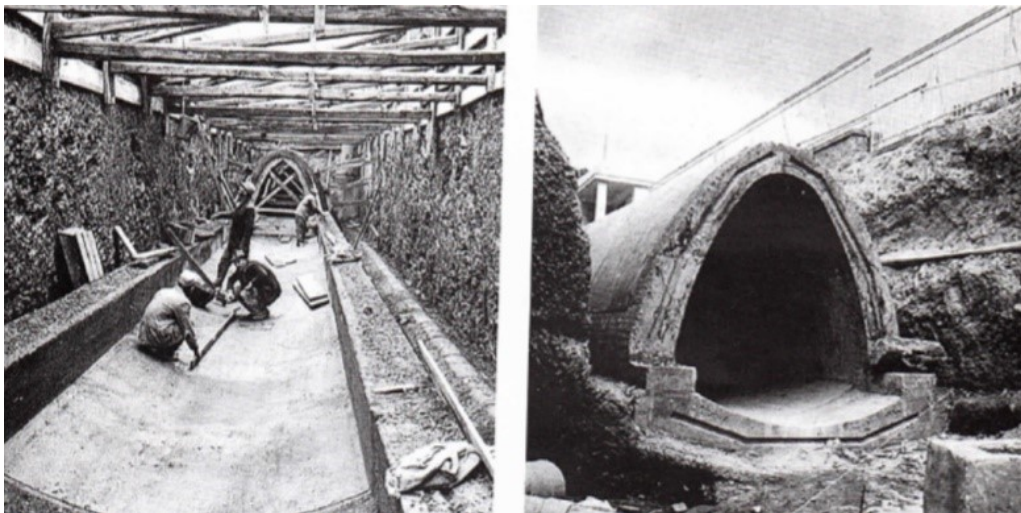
Construction project of water collecting pipes at Sotiria section (Παπαδάκης, 1997)
